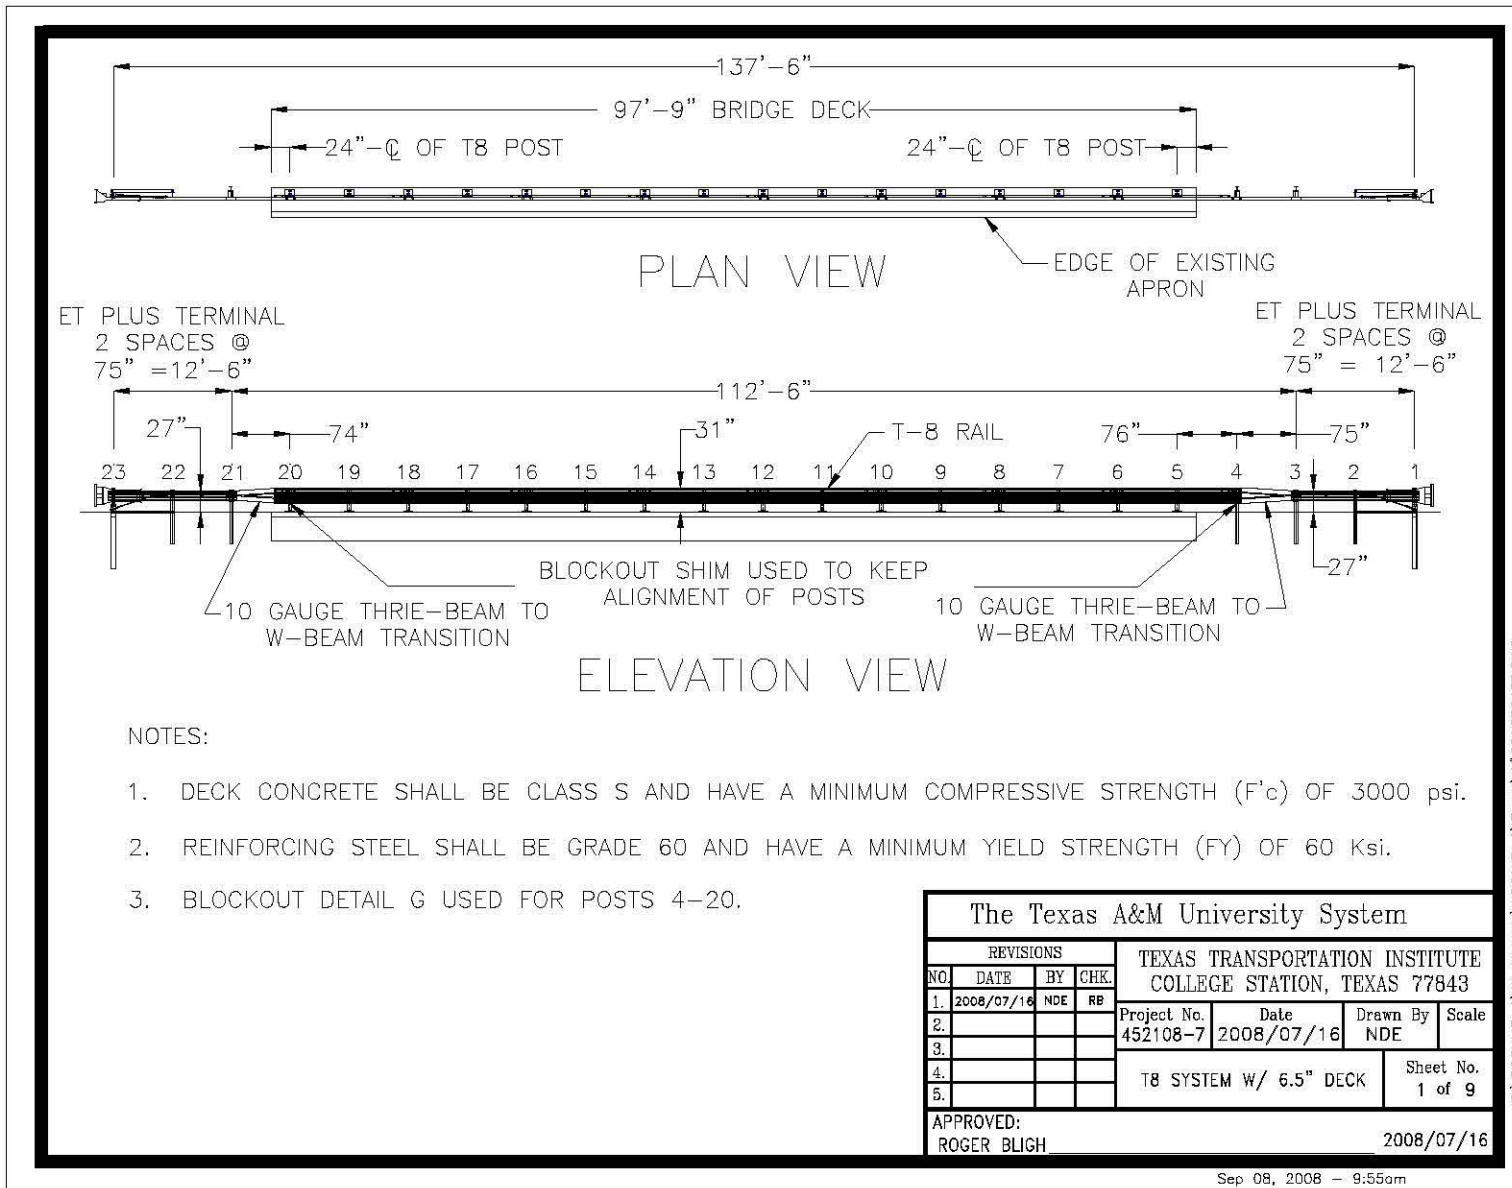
Details of the T8 Bridge Rail Installation – Plan and Elevation.
